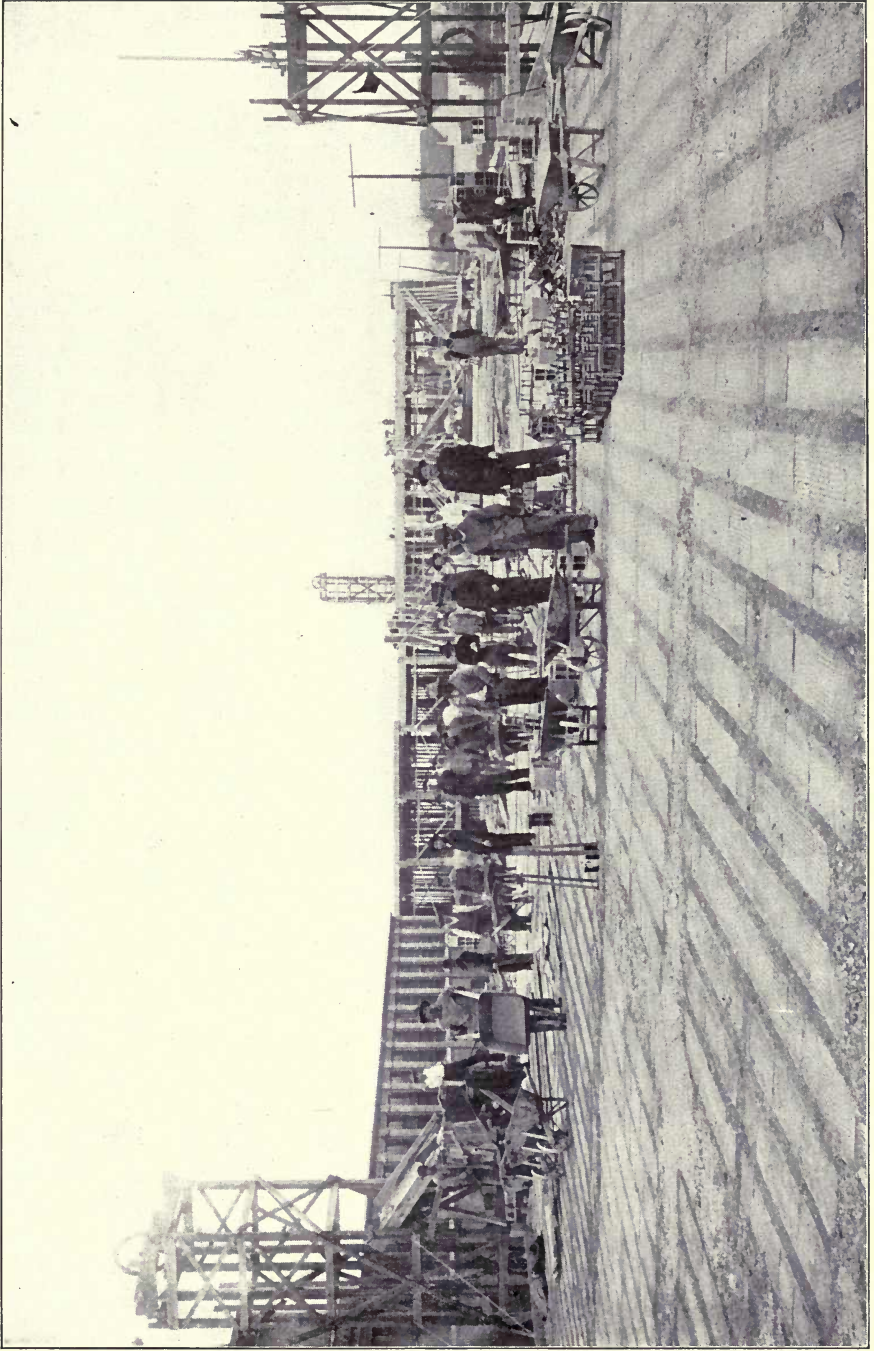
Concrete and Tile Floor Under Construction. (See p. 138.)
